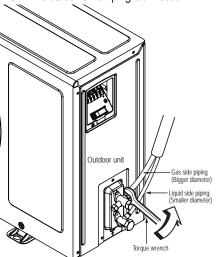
LSU180HEV/HEV1 Outdoor Unit Piping Connection.
